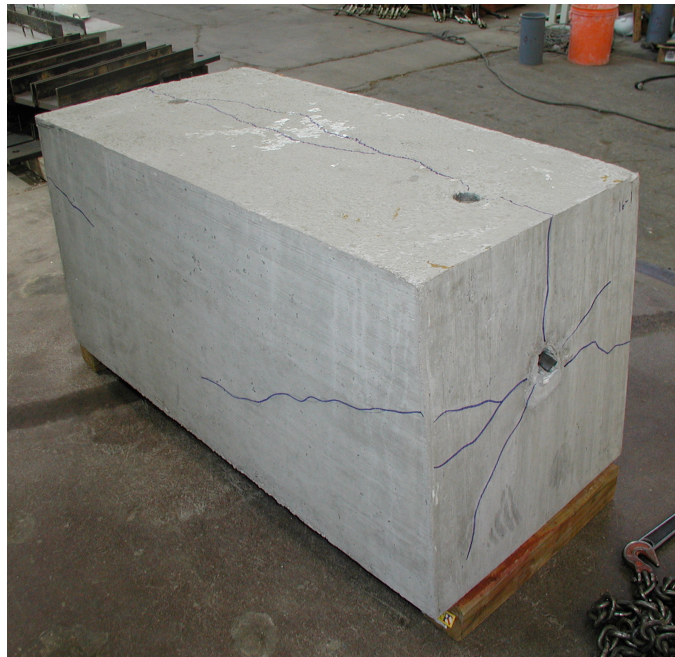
and Figure 5-41 show the pattern of cracking observed in the specimen. Splitting cracks radiated out from the duct on the dead end. The top crack extended the entire length of the specimen and down the live end to the duct. One longitudinal crack extended halfway down the side of the specimen.
